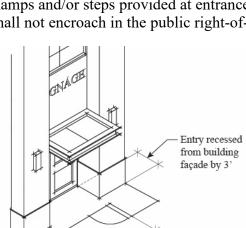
Entry recessed from street-facing building facade to create an alcove.
